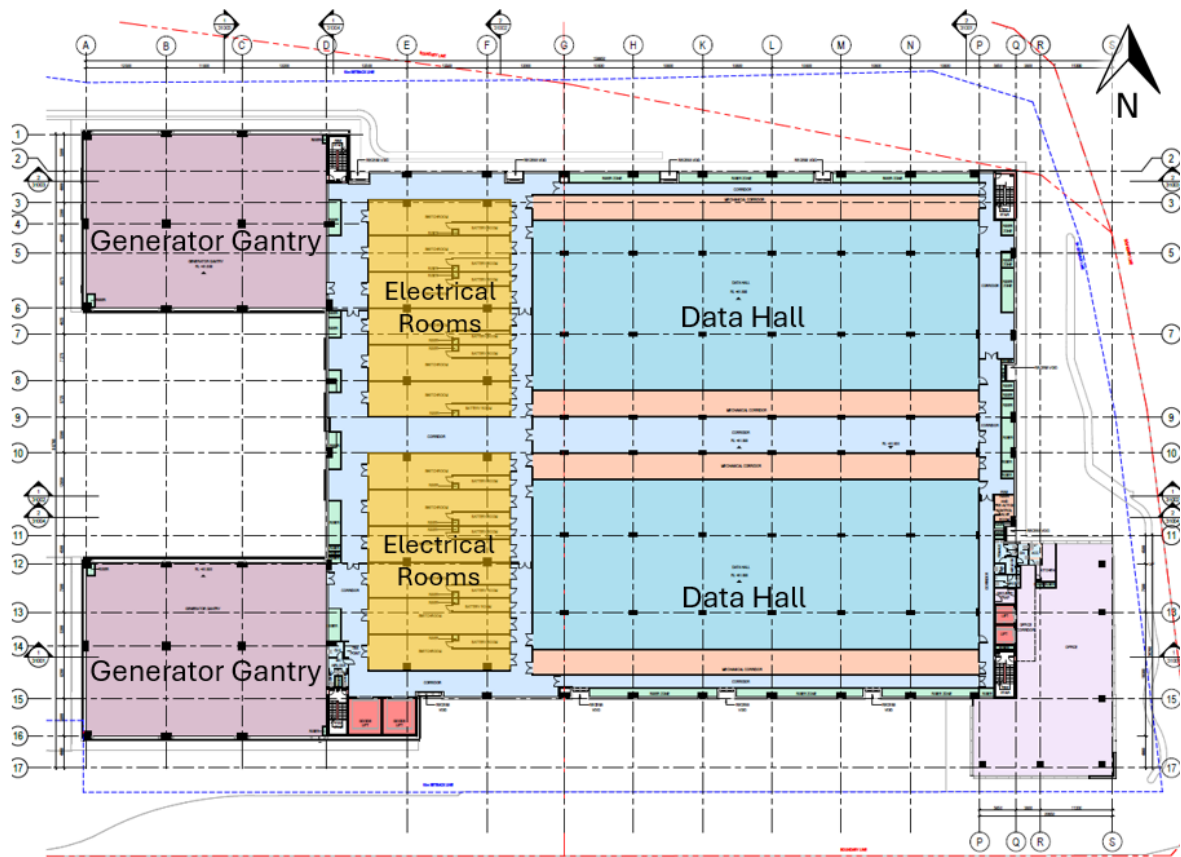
| Typical Data Hall Level Layout Plan (Levels 1, 3, 5 and 6)
